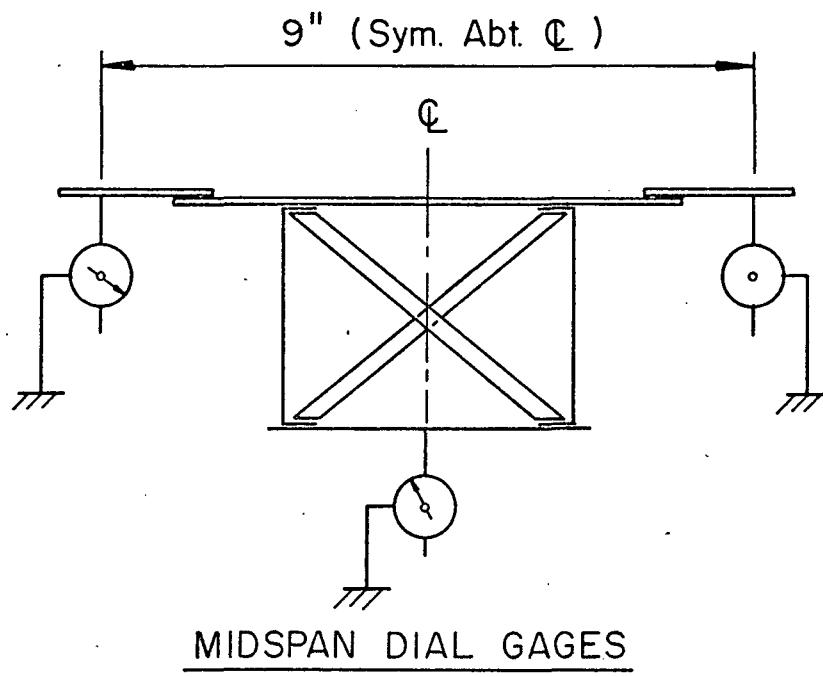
Dial Gage Arrangement - Specimen M1
